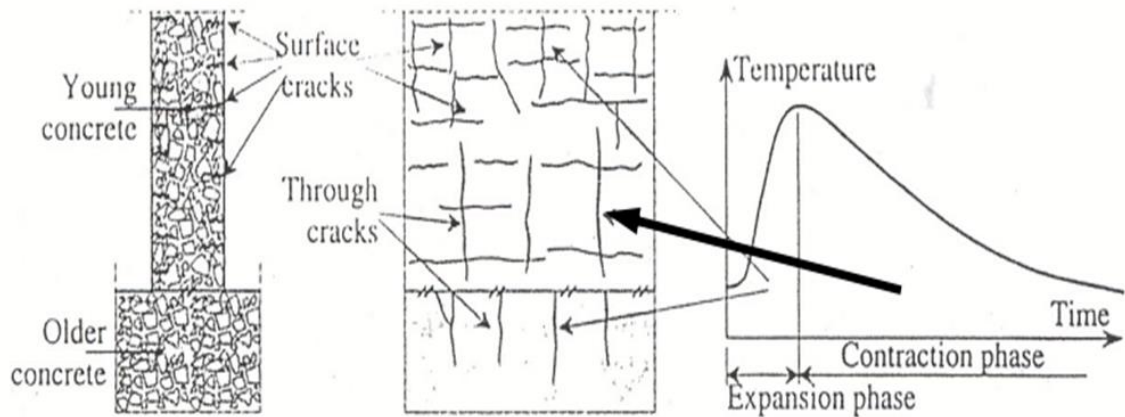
4 Example of cracking in a concrete wall due to internal and external restraint [3]
